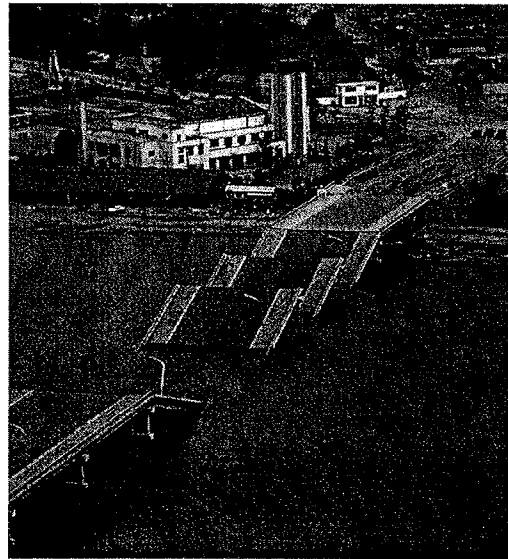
1964 Niigata Japan: Showa bridge collapse due to pier collapse caused by liquefaction.
